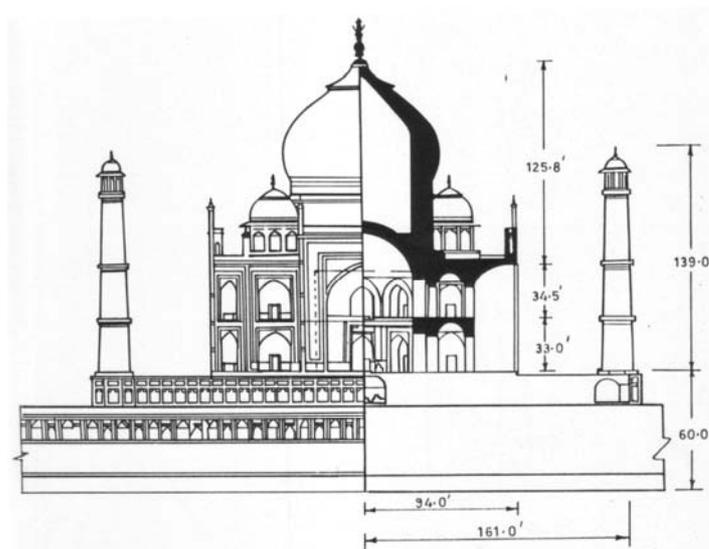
Part elevation and part sectional elevation of the Taj Mahal (1 ft = 0.3048 m)
